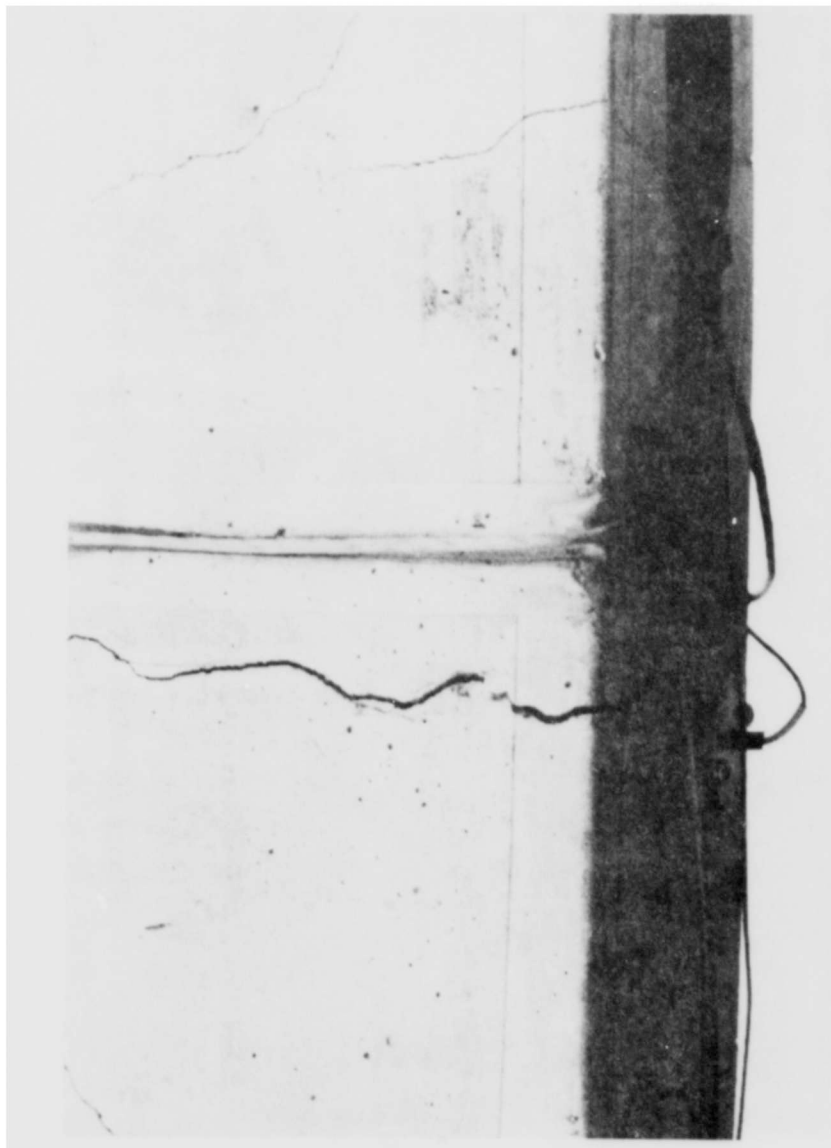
Side and Bottom Views of Beam 2 After Test No. 11
